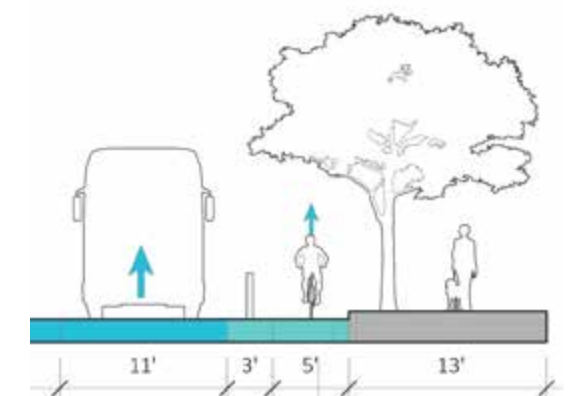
Bus on a Typical Downtown Collector Street with a One-Way, In-Street Class IV Bikeway.
